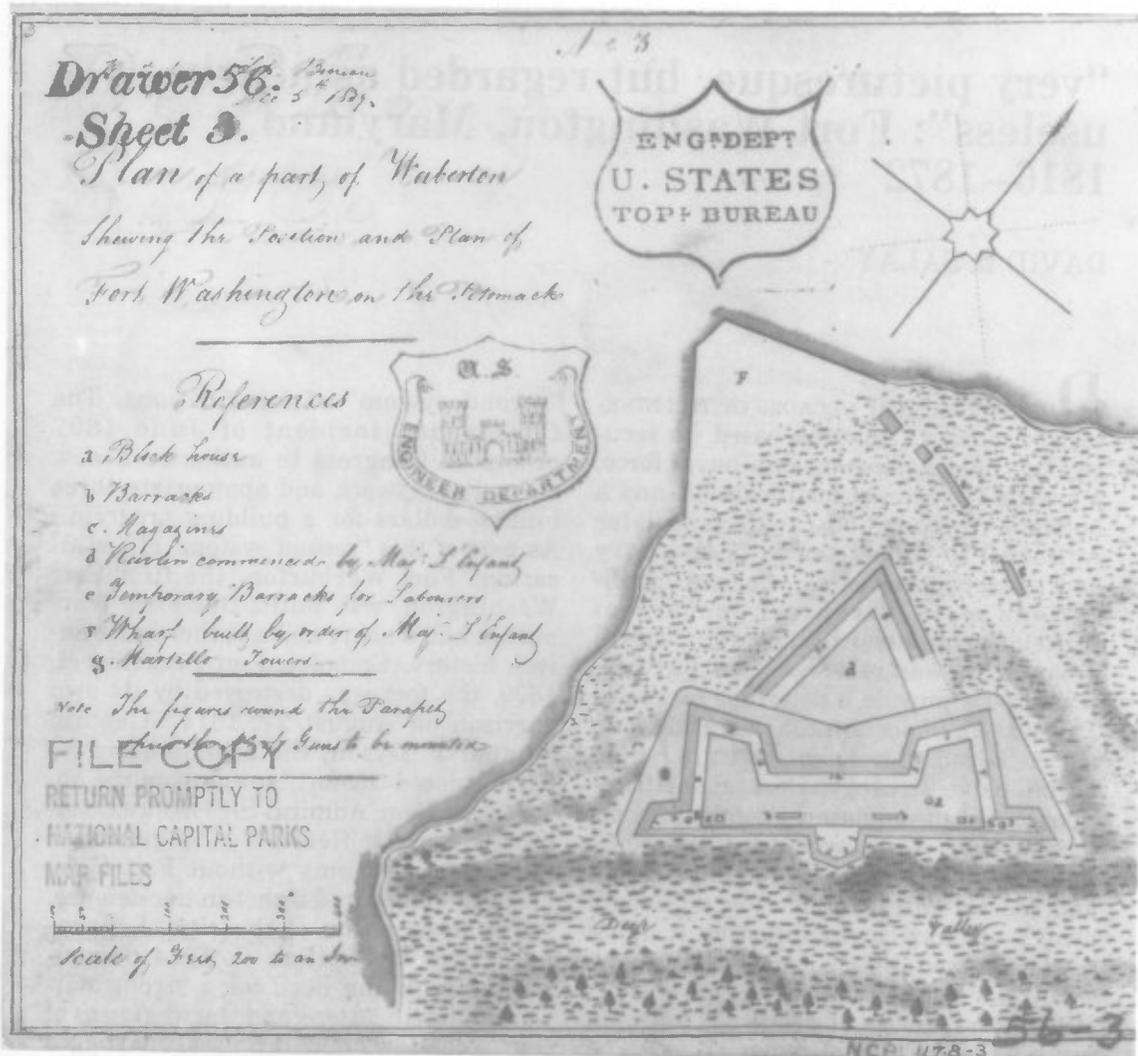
Plan of a part of Waberton Shewing the Position and Plan of Fort Washington on the Potomack, c. 1815. This view shows a plan of the fort while it was still under construction with its line of temporary workers' houses (e) and recommendations on the number of guns to be mounted. The scale of the barracks and officers' quarters is incorrect but the plan indicates the fort's relation to the Potomac and the surrounding topography. RG 79, NCP 117.8-39, Map Division, National Archives (NA).
